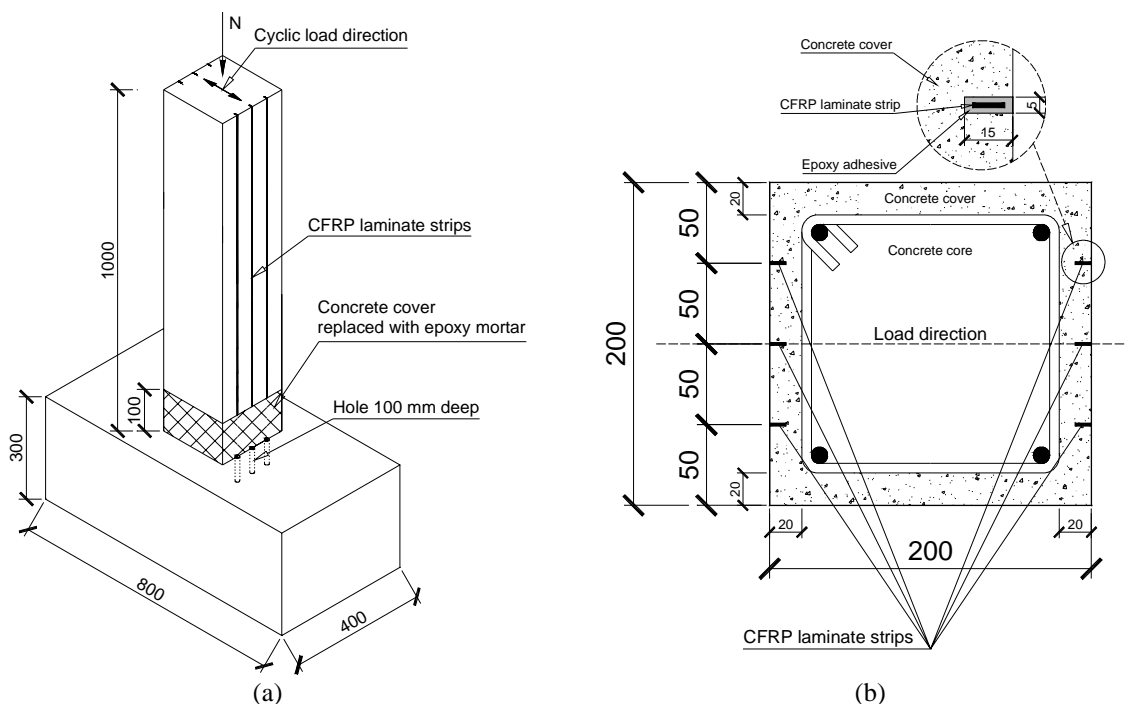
NSM technique applied to reinforced concrete columns: (a) test specimen; (b) cross section of the columns (Ferreira 2001). Note: all dimensions are in millimeters.
